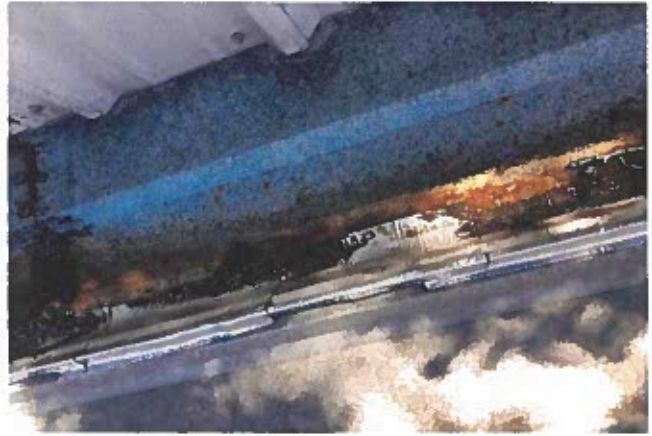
Office Roof - Left slope; dirt and debris at gutter end
